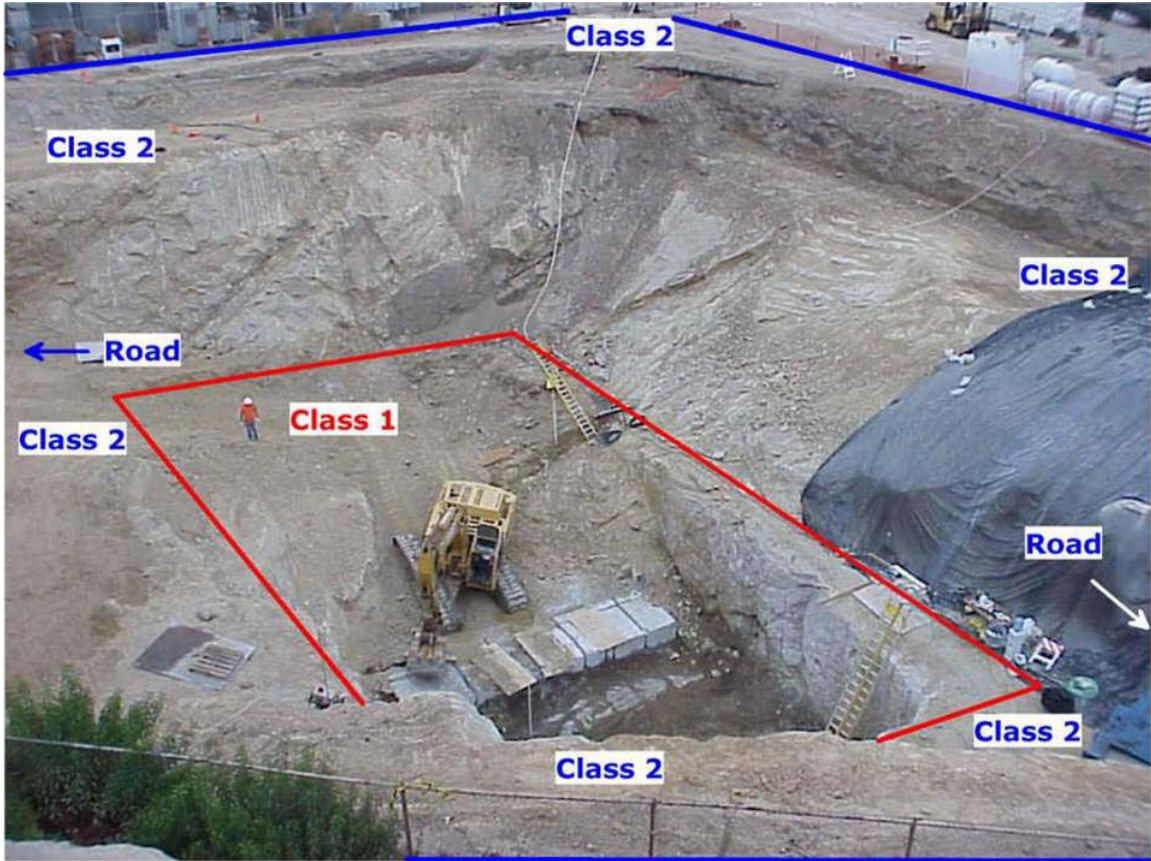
Phase A Area Photo Showing Removal of Basement Concrete
